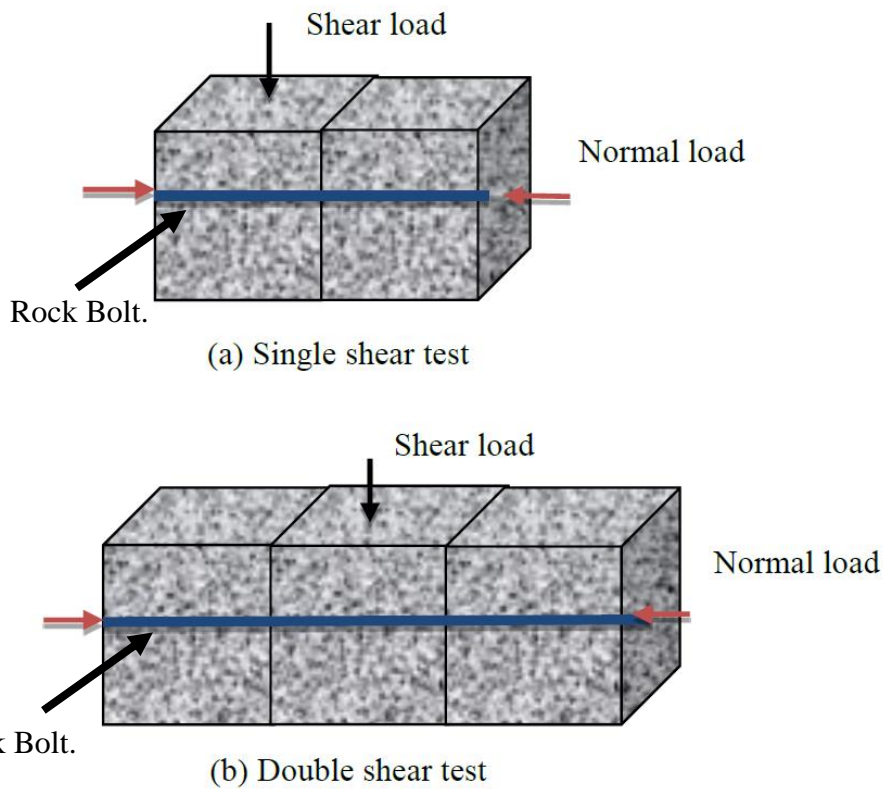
Single and double shear tests layout. (Li, 2016)
